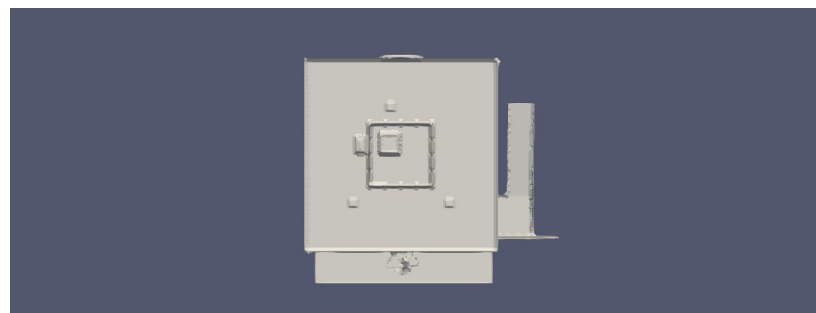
Extracted building envelope of the Institute-Var-2 model
